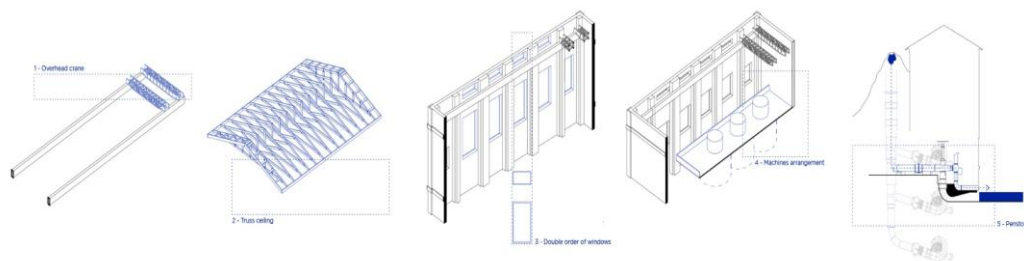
Main Features of the Turbine Hall: Overhead Crane, Truss Ceiling, Double Order of Windows, Machines' Arrangement, and Penstock's Connection
